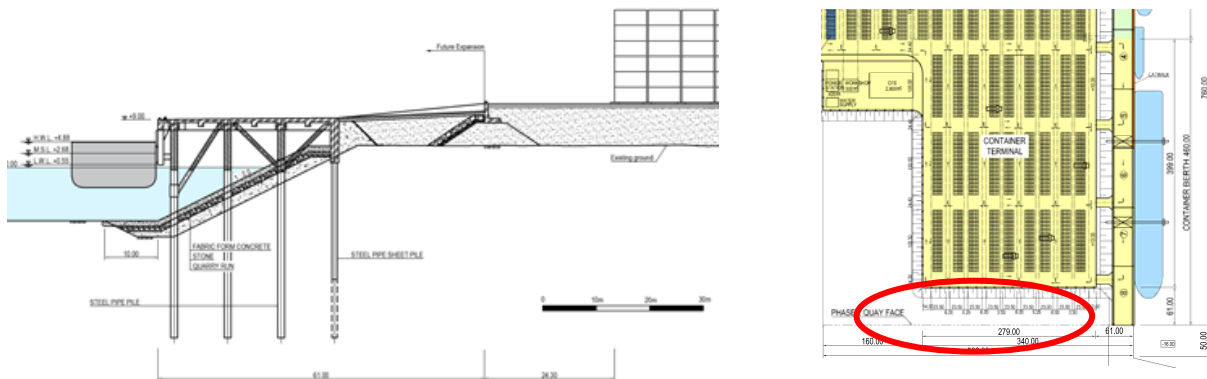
East Revetment and future Expansion of Mooring Facilities (Phase 2)
